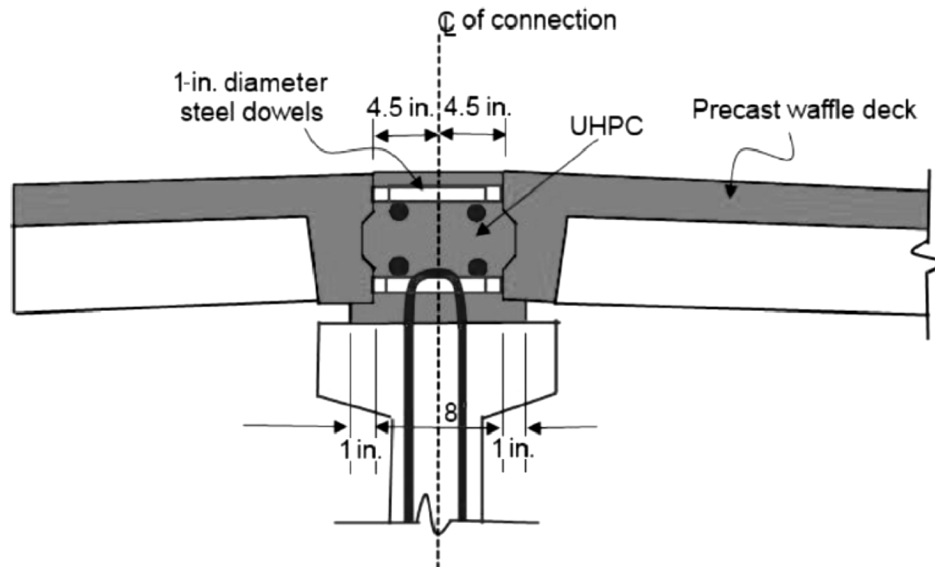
Longitudinal Joint Detailing for UHPC Waffle Deck Panel System (Aaleti and Sritharan, 2014)
